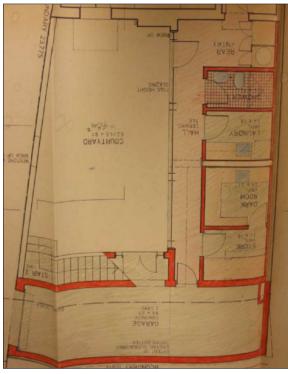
Part of the existing rear wing was proposed to be retained with new brick walls (in red), alterations and additions to the ground floor including a new garage and external stair.
